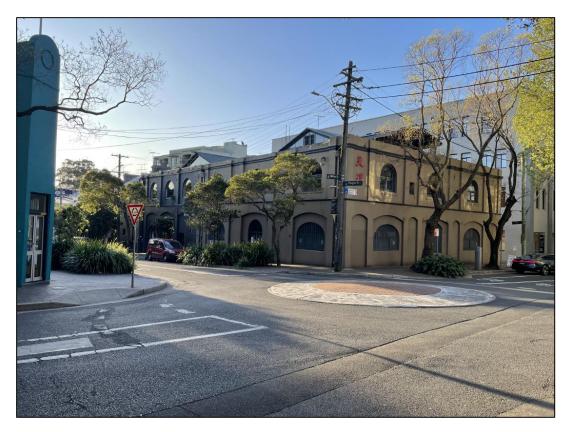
Site viewed from intersection of Meagher St and Balfour St
